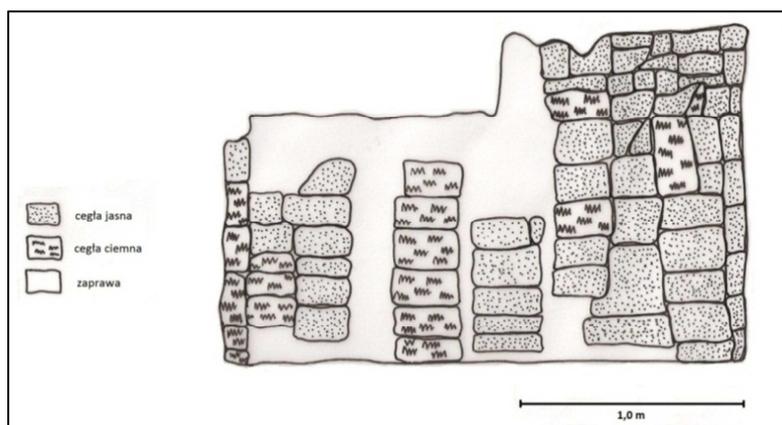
A draft of bricks' arrangement (plan) from the fourth fragment of a wall. (Cegła jasna- light brick, cegła ciemna – dark brick, zaprawa- daub)
